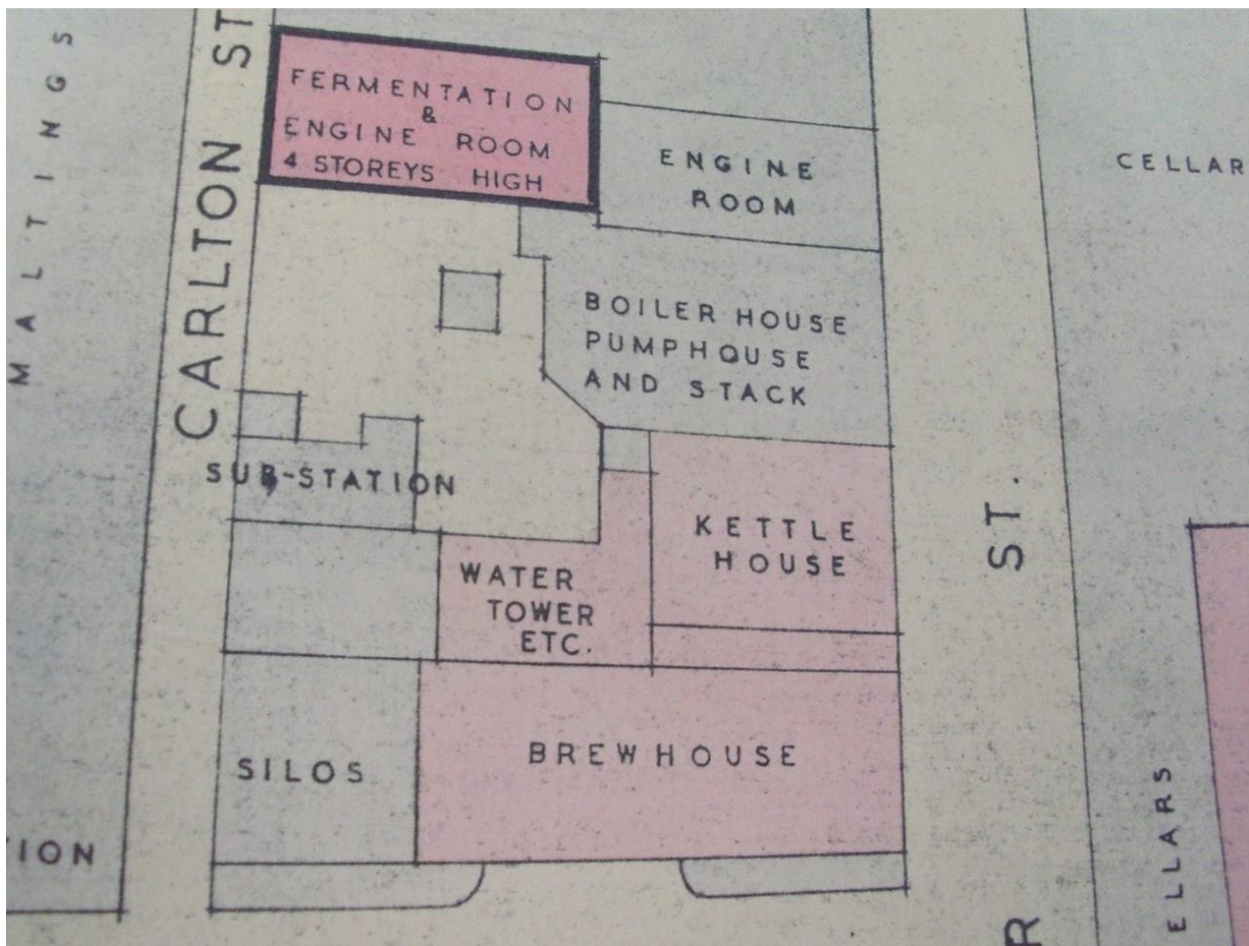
Section of block plan showing Irving Street Brewery Buildings by Lemont Niblett and Daubney, Drawing No. 798, MA9691 dated 31-03-55
